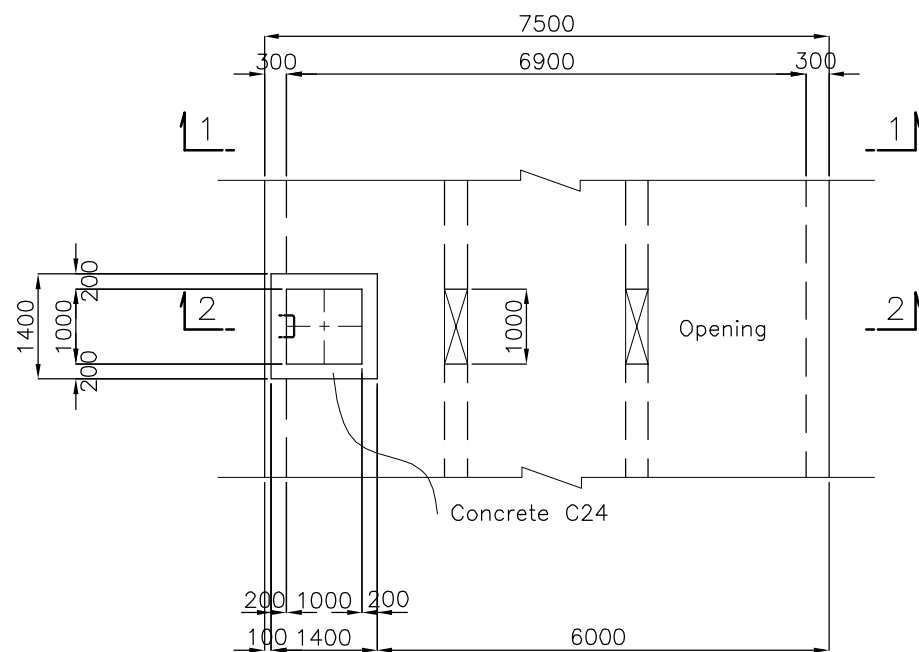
BOX CULVERT 2.9*2.9 S=1:200
